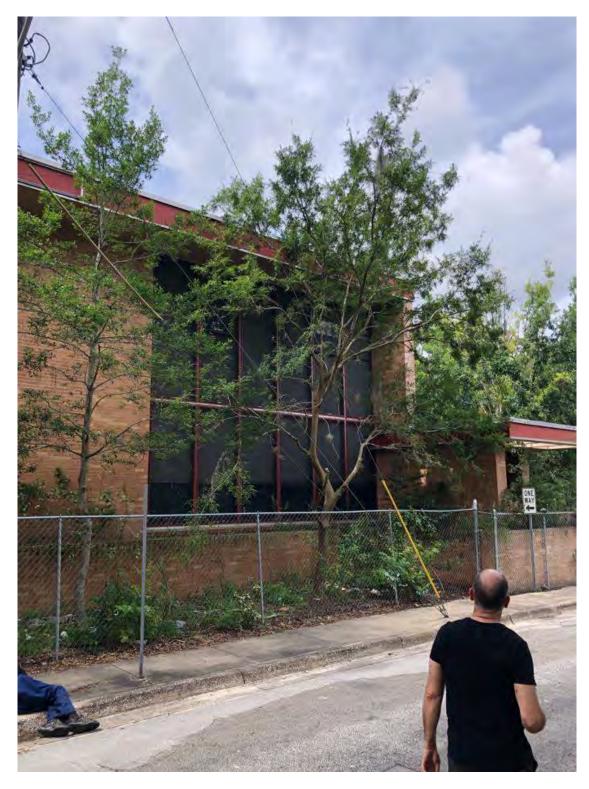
EAST EXTERIOR FACE OF BUILDING
